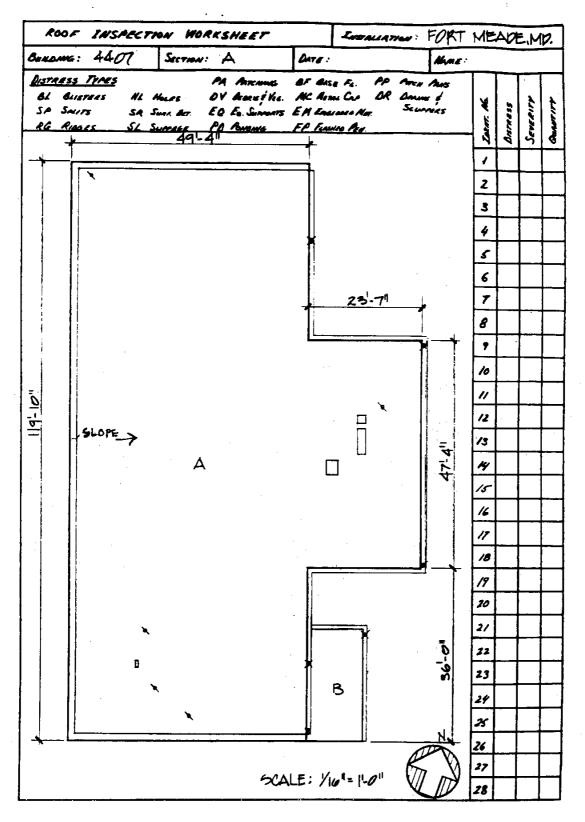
Roof Inspection Worksheet with roof plan.
